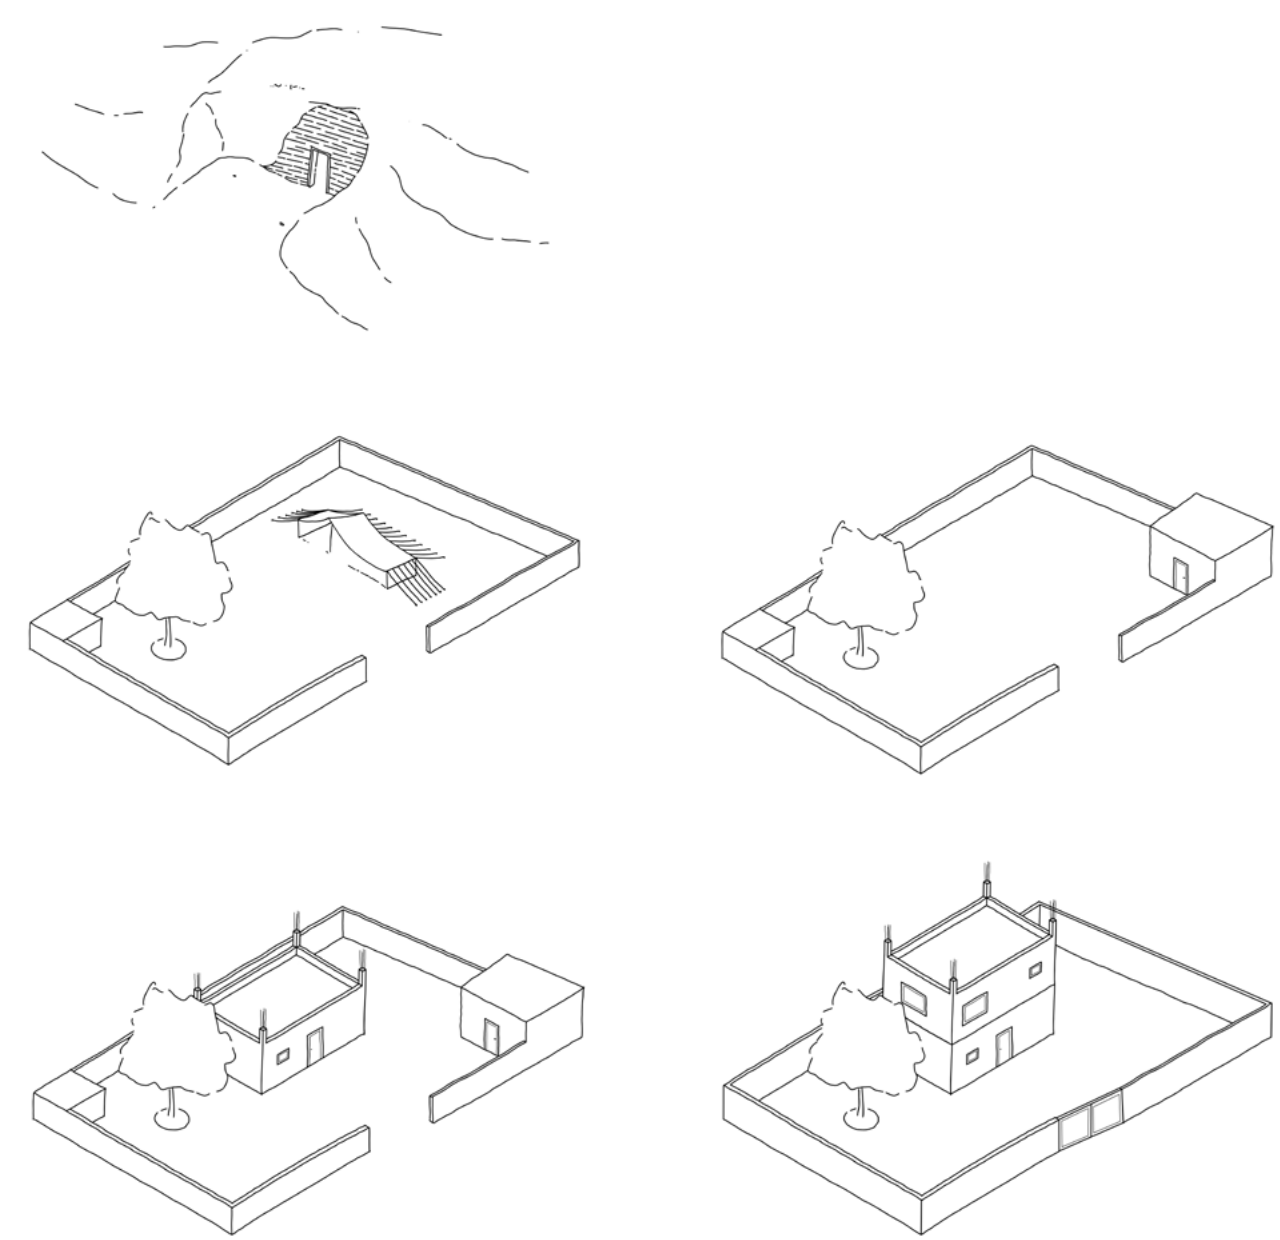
Overview of dwelling types ranging from caves and Bedouin tent, mud house, simple concrete house, and the reinforced concrete house
